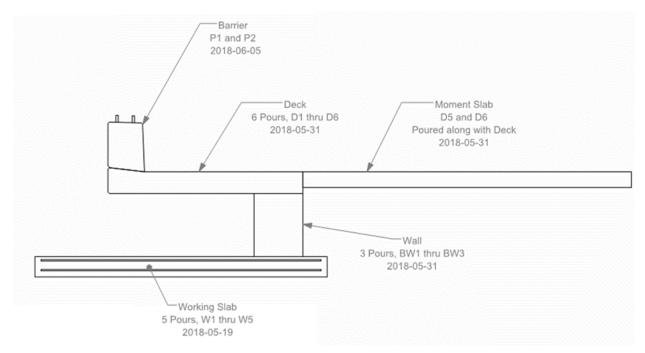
Concrete Map Overview of the of the PennDOT PA Bridge Barrier
